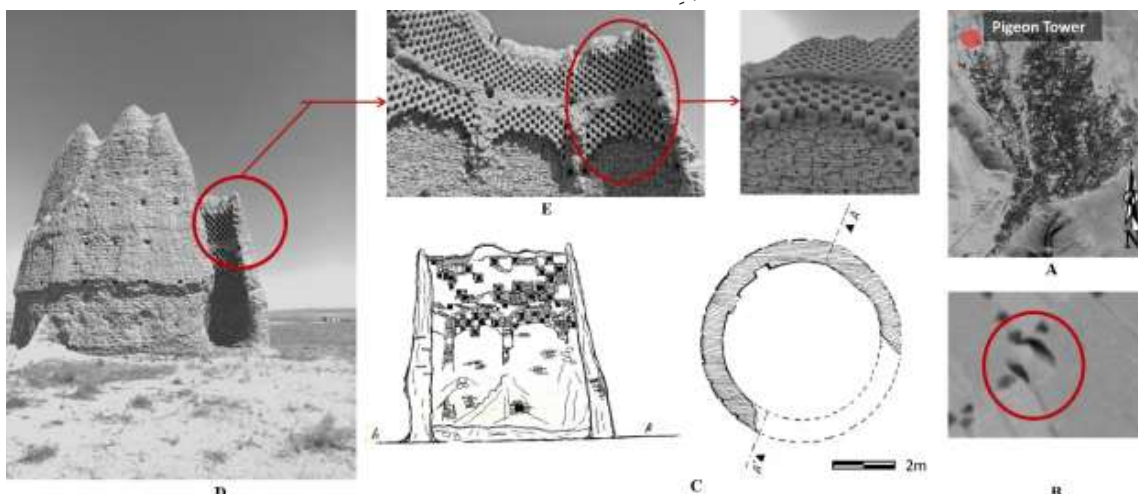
A. Location of the Hajj-Faraj-Allah Tower in Vaneshan. B. The tower in the aerial photo in 1969 also suffers from damage similar to the current state. C. Sketch of plan and section of the tower in its current state. D. View of the Hajj-Faraj-Allah Tower, a Pigeon Tower with observation function at the same time E. Interior details of the tower.
